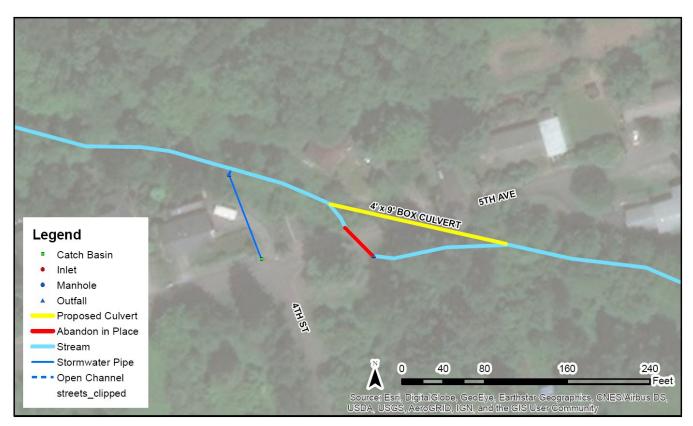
Project C-2. 5th Avenue Culvert Replacement (Proposed alignment)
